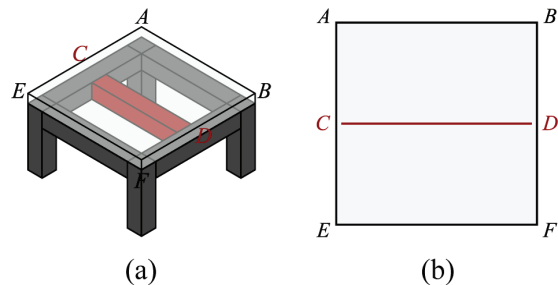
Assumed structural diagram for the beam design: (a)elevation and (b)floor plan.
